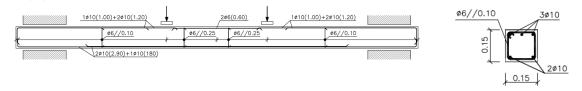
Clamped Beam: a – longitudinal view; b – Cross section
